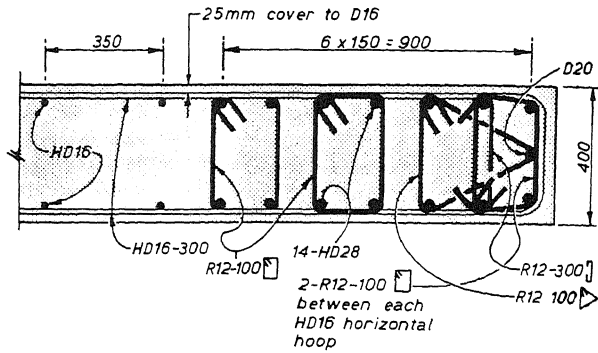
The Confinement of Compressed Regions of a Wall Section.
